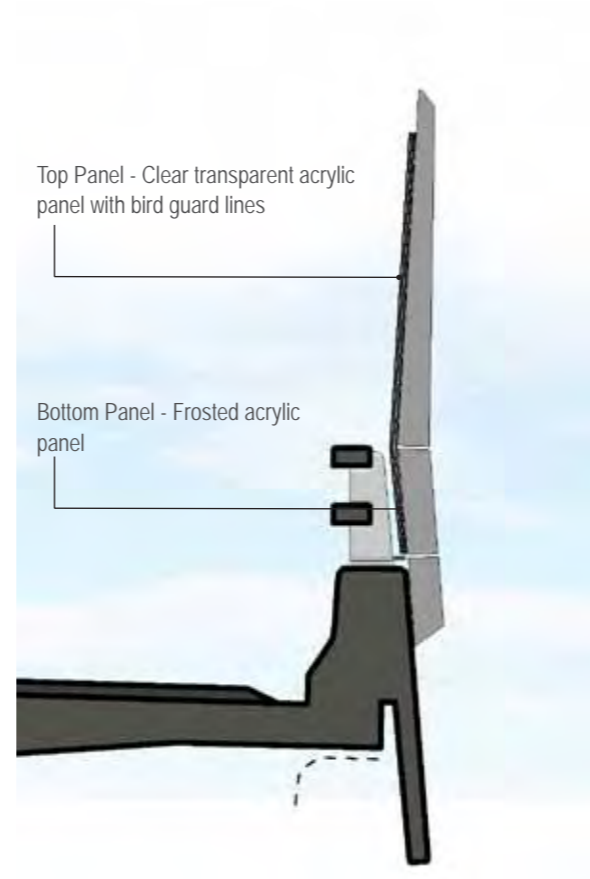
Noise Wall - Cross section (Scale 1:10)
